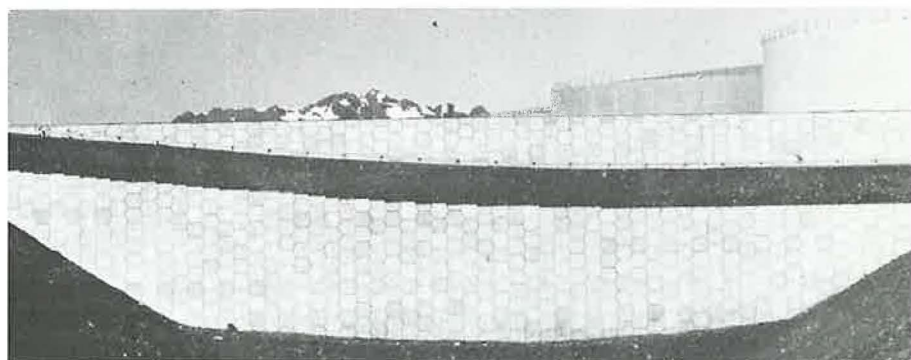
Concept of the Vidal Reinforced Earth wall.
